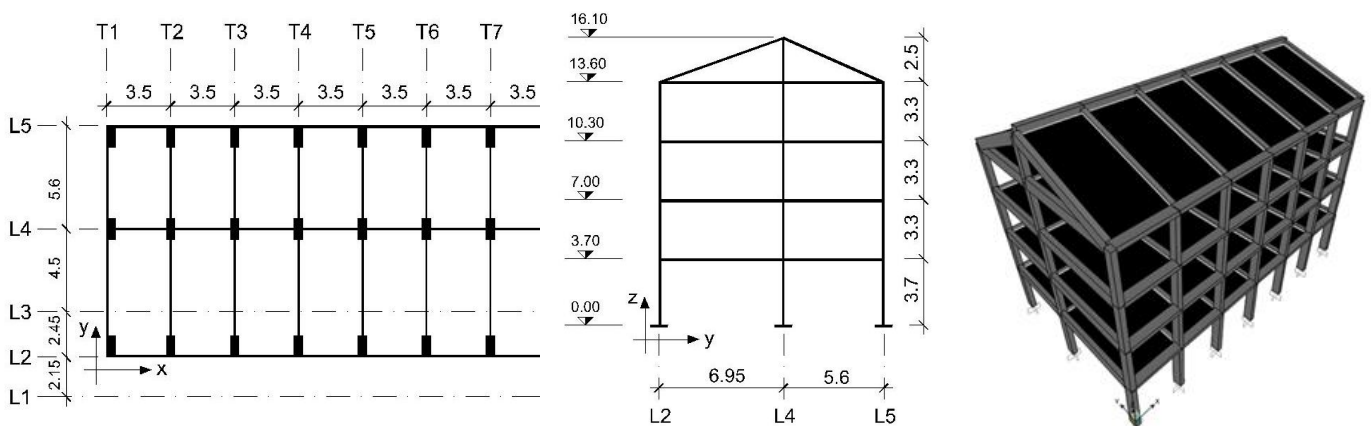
Structural scheme of the analyzed structure: plan view (a), section (b) and tridimensional model (c) / Schema strutturale del corpo di fabbrica analizzato: pianta (a), sezione (b) e modello tridimensionale (c)
